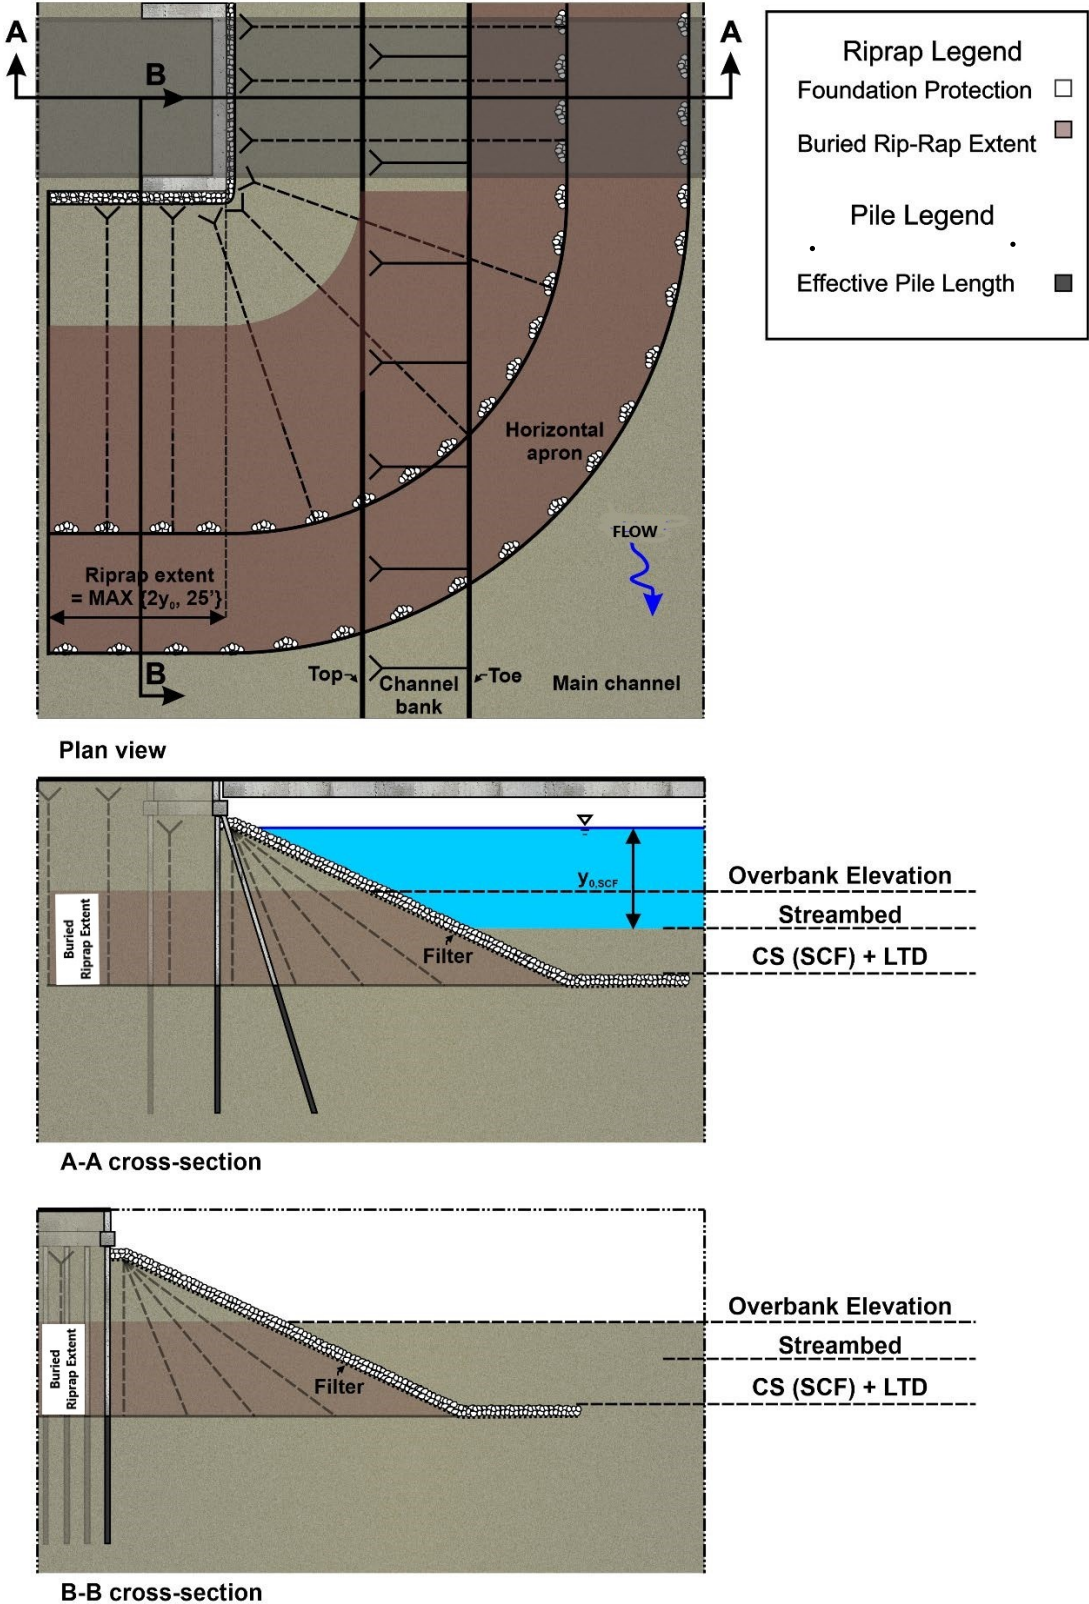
Abutment countermeasure design with the riprap placed below the contraction scour (SCF) elevation plus LTD.
